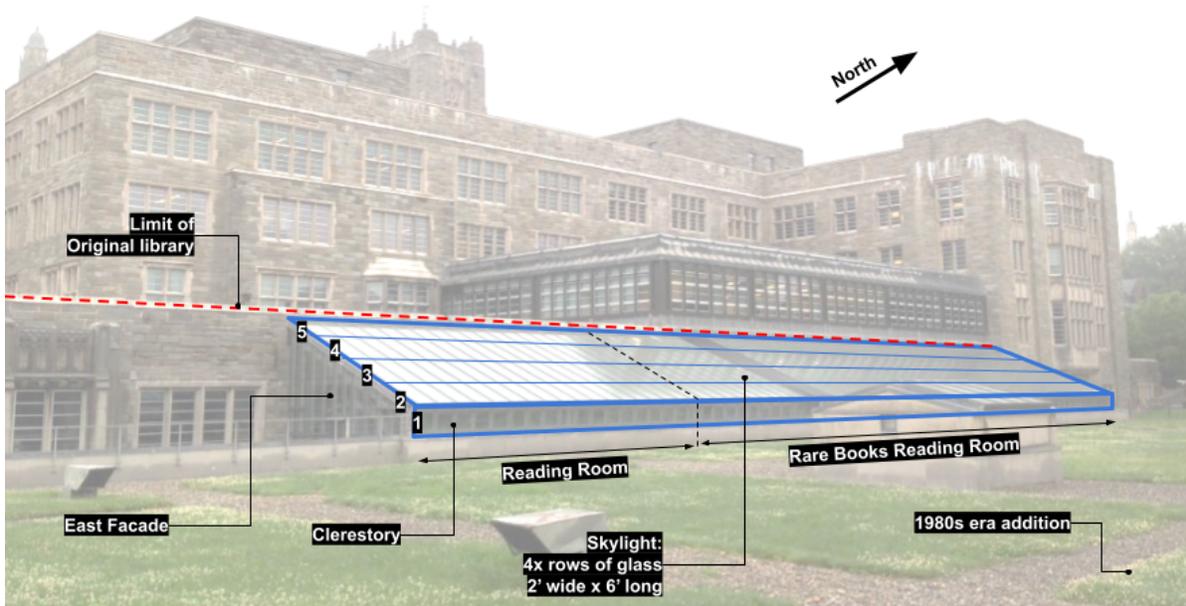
Diagram of the skylight exterior, taken from the roof of the addition before the renovation, showing glazing elements and orientation.
